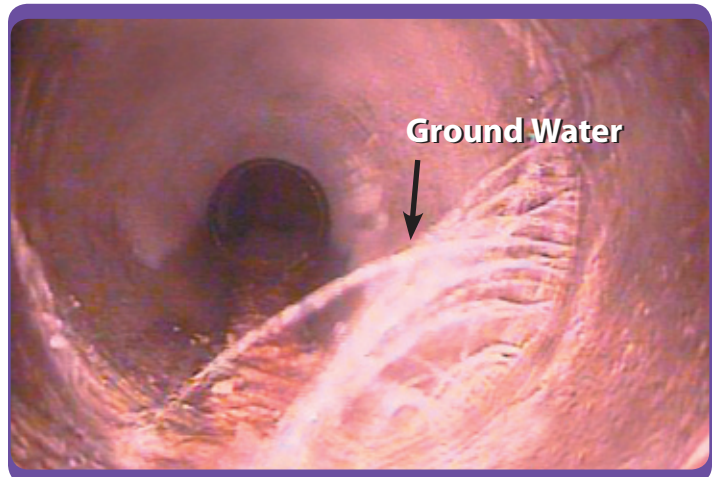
Groundwater entering a sewer pipe through cracks
